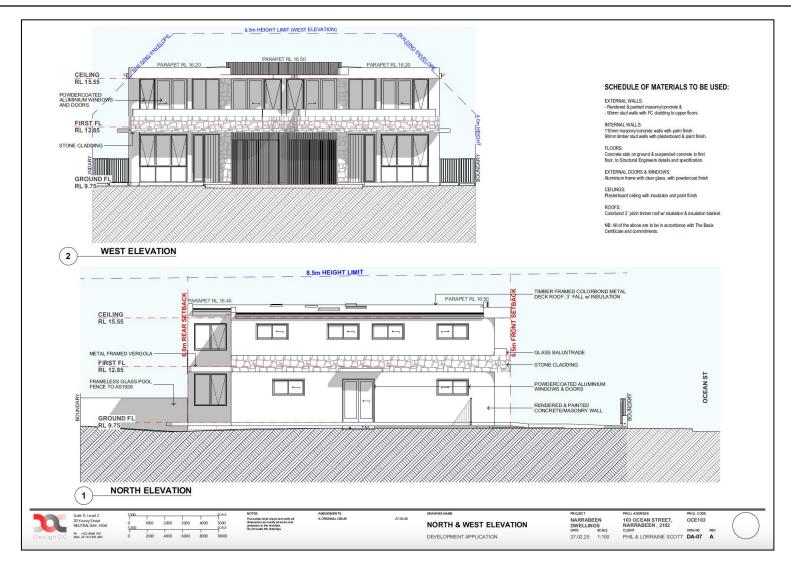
PROPOSED NORTH & WEST ELEVATION
